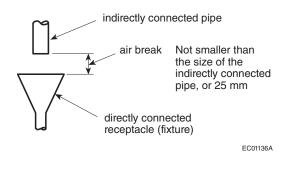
(2) Air Break A-2.3.4.6.(1) Support for Underground Piping. See explanation for Subsection 2.3.5. for additional protection required for underground pipes. Permitted installations are shown in Figure A-2.3.4.6.(1)(a). The methods of support shown in Figure A-2.3.4.6.(1)(b) are not permitted because the base does not provide firm and continuous support for the pipe.
